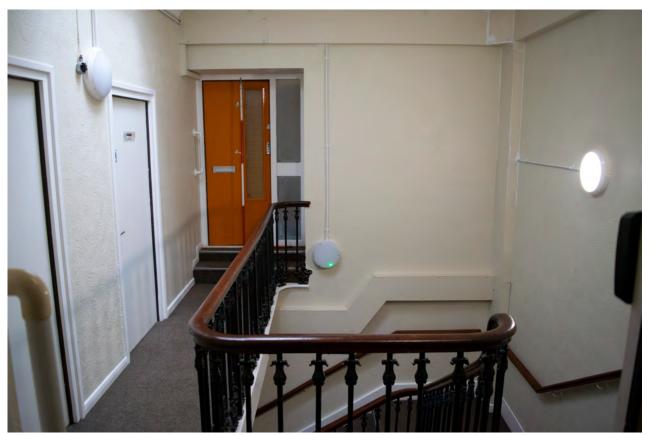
West facing viewing of upstairs landing and staircase. 2mx1m scale.
